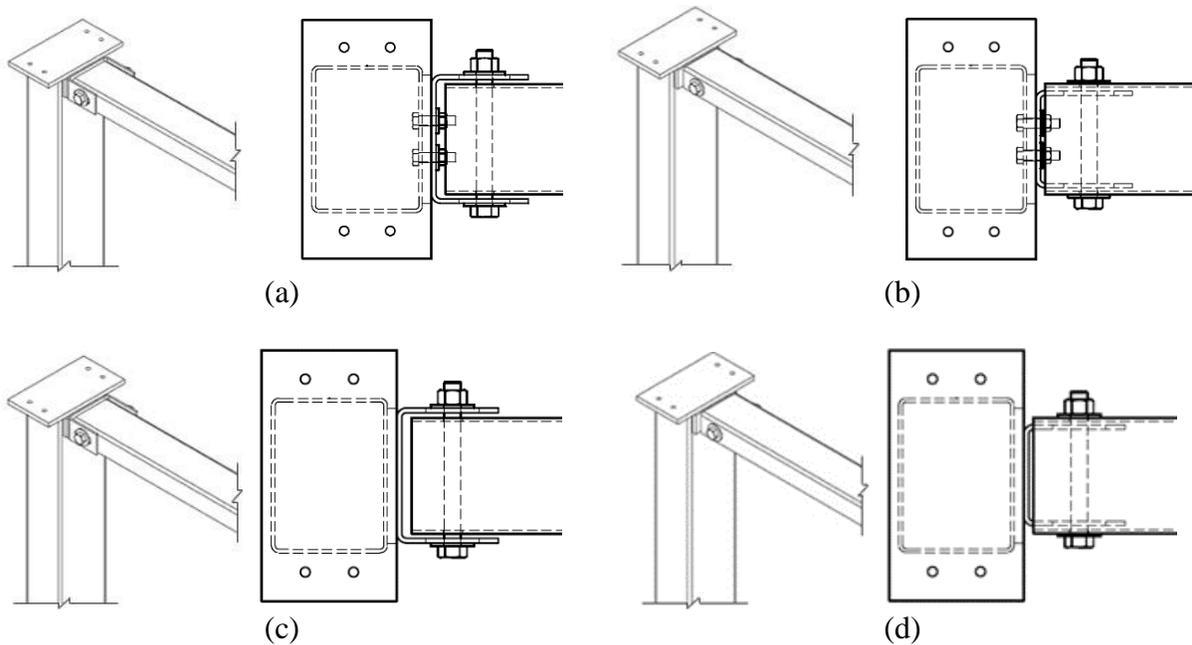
Ground Line Strut Design Concepts: (a) No. 1 – Bolted Yoke Outside Strut, (b) No. 2 – Bolted Yoke Inside Strut, (c) No. 3 – Welded Yoke Outside Strut, and (d) No. 4 – Welded Yoke Inside Strut
